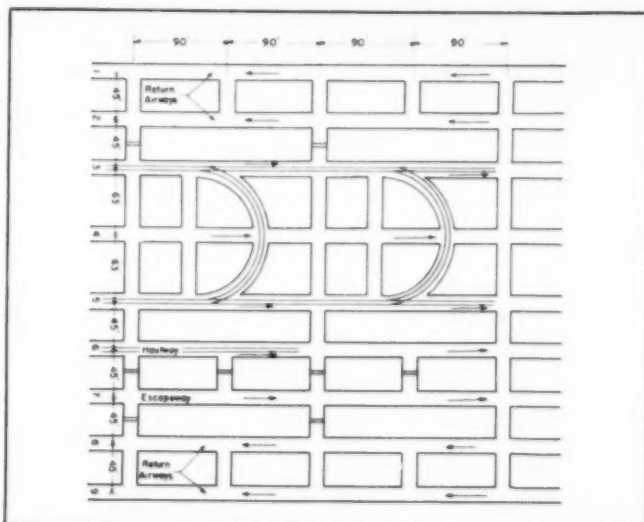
NINE-ENTRY MINING PLAN provides escapeway on a separate split of intake air, eliminates doors and reduces ventilation control checks to a minimum.
